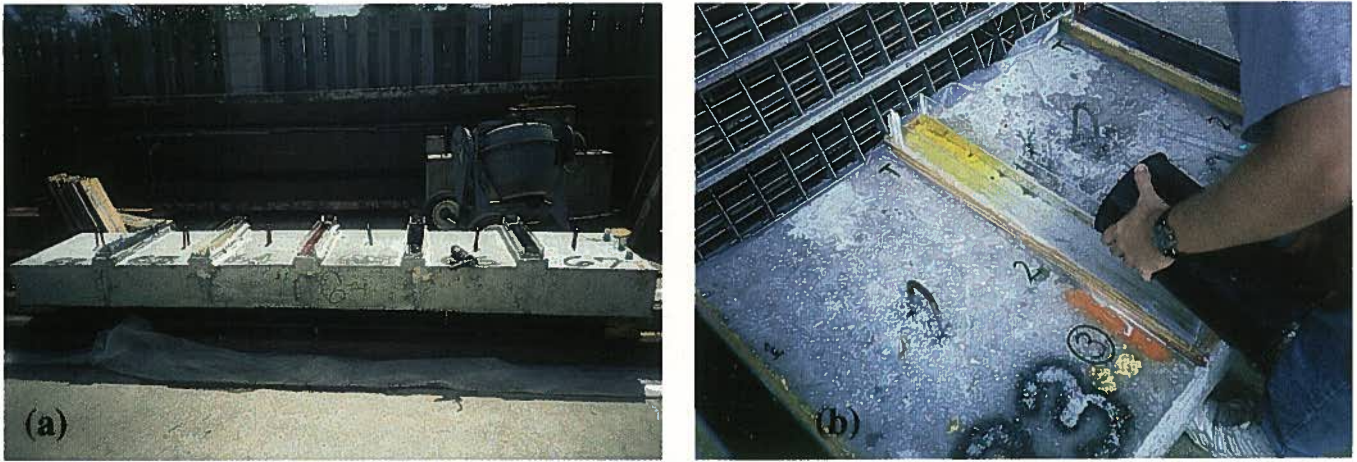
Photographs of beam test: (a) Erected beam with simple supports; (b) Joint seepage test in progress.
